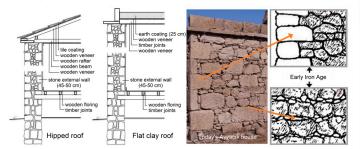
System cross-section of today's Ayvacık houses and similarities of wall bonding technic between traditional Ayvacık houses and the houses of the Early Iron Age.
